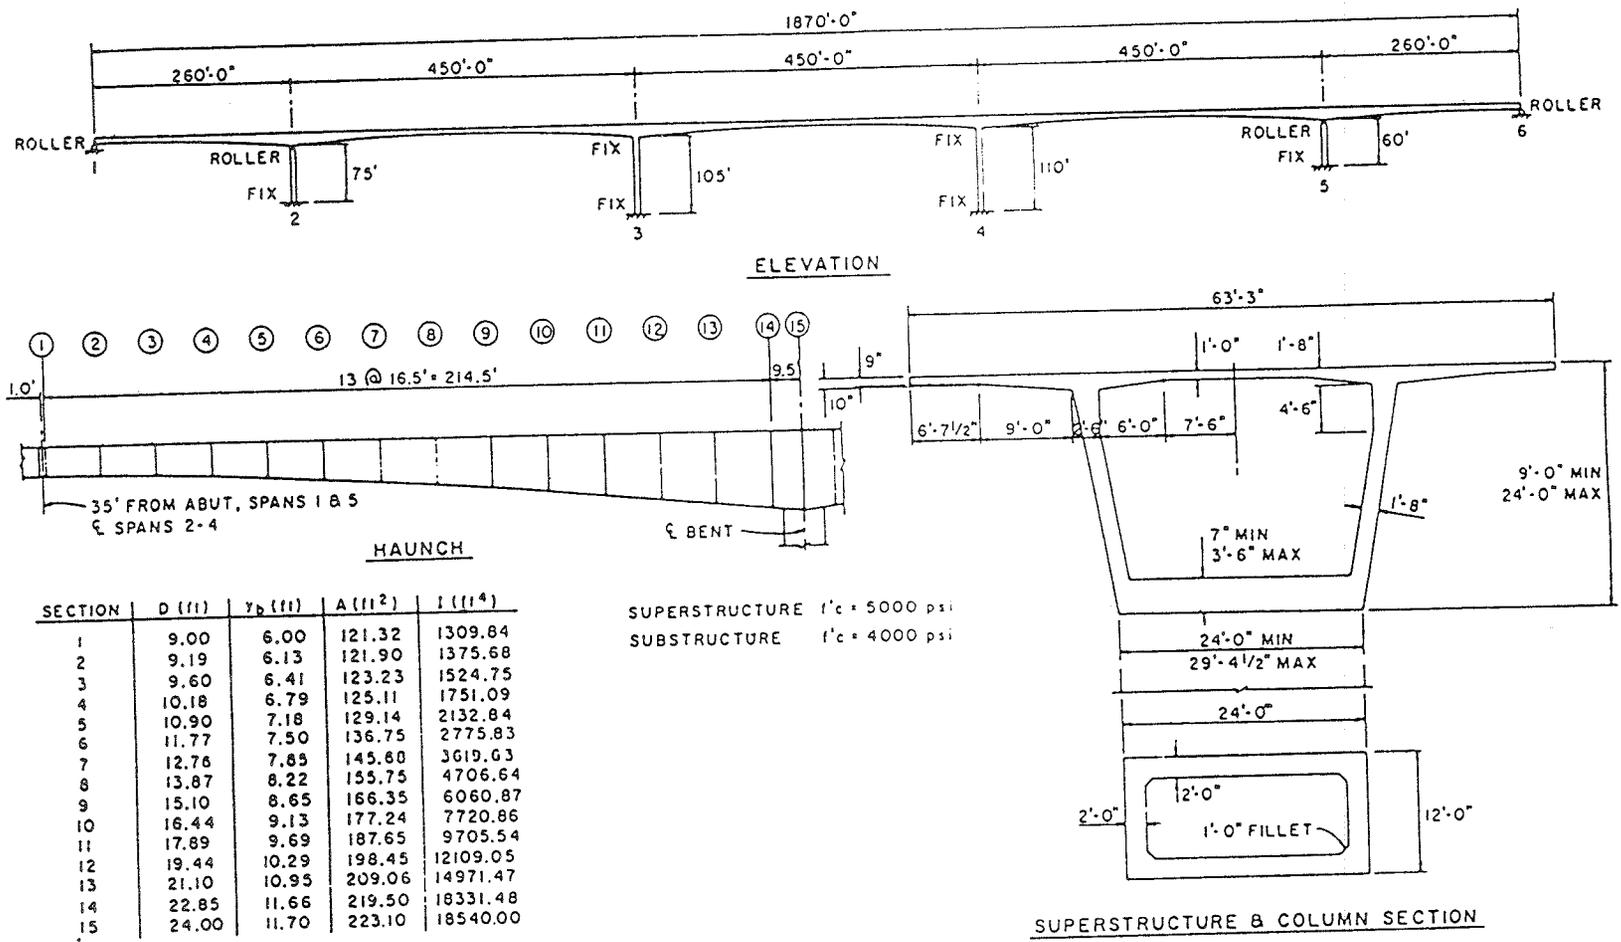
Case 5L: Columbia River Bridge superstructures and substructure details used for analysis.
